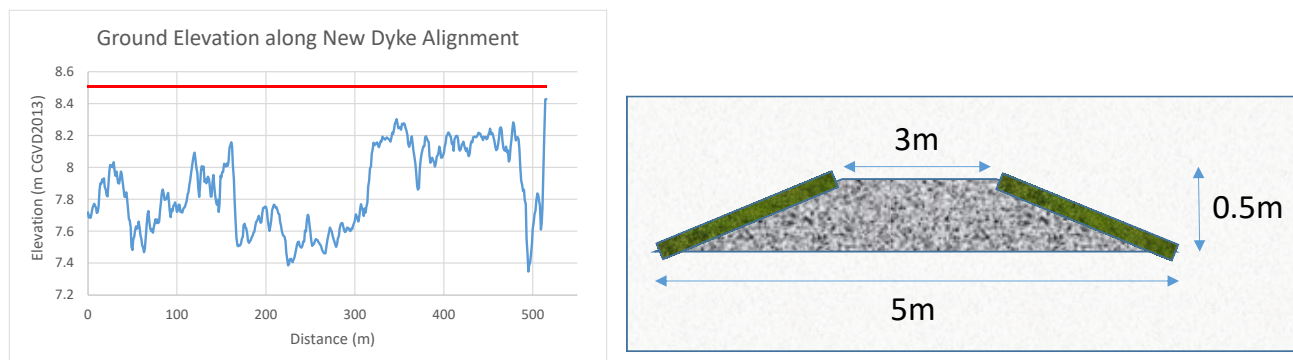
Schematic Profile and Cross-Section of Elevated Path
